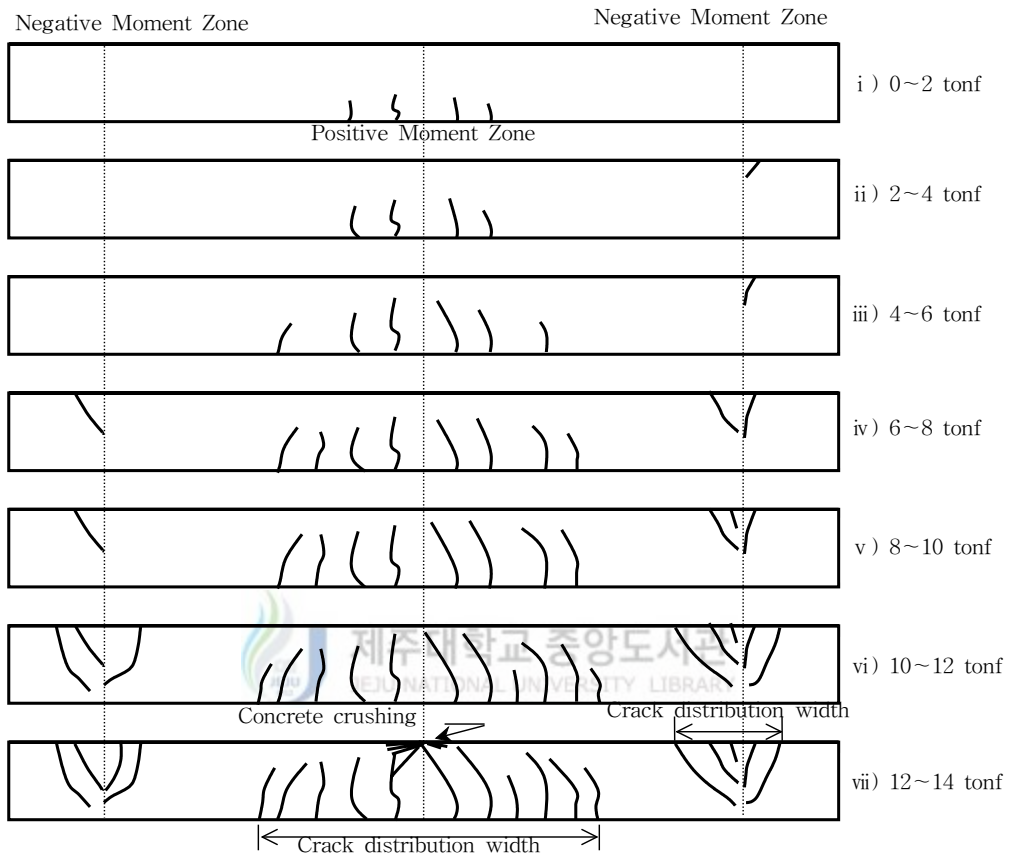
Crack propagation with different load levels in HRS concrete slab
